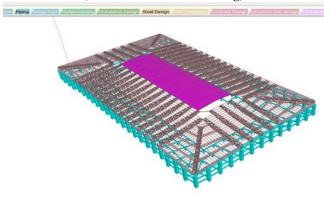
Model II: 3D Model of Roof Truss stadium (with shell roof covering)
